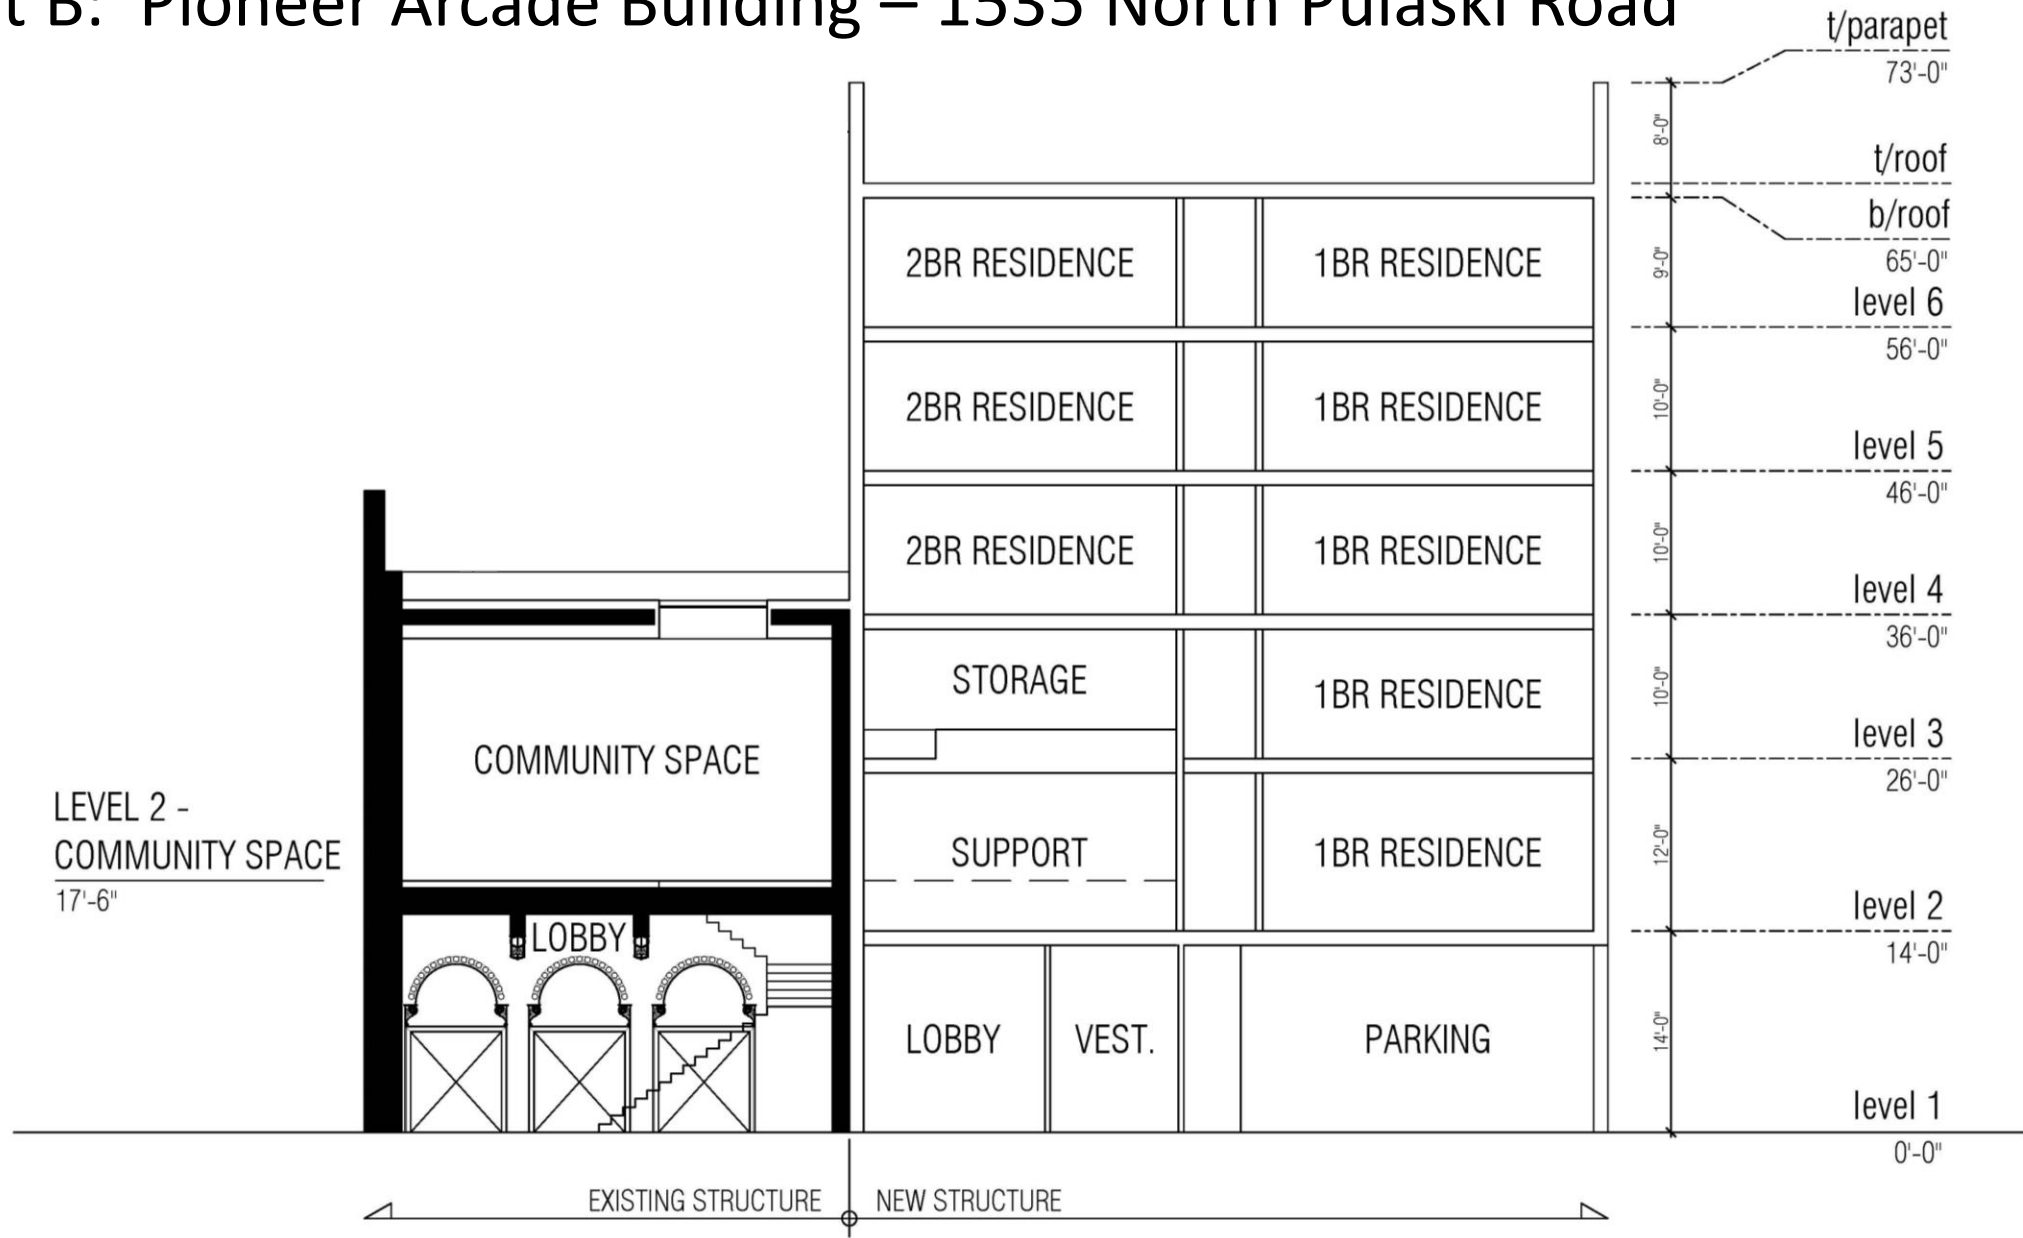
Exhibit B: Pioneer Arcade Building – 1535 North Pulaski Road
